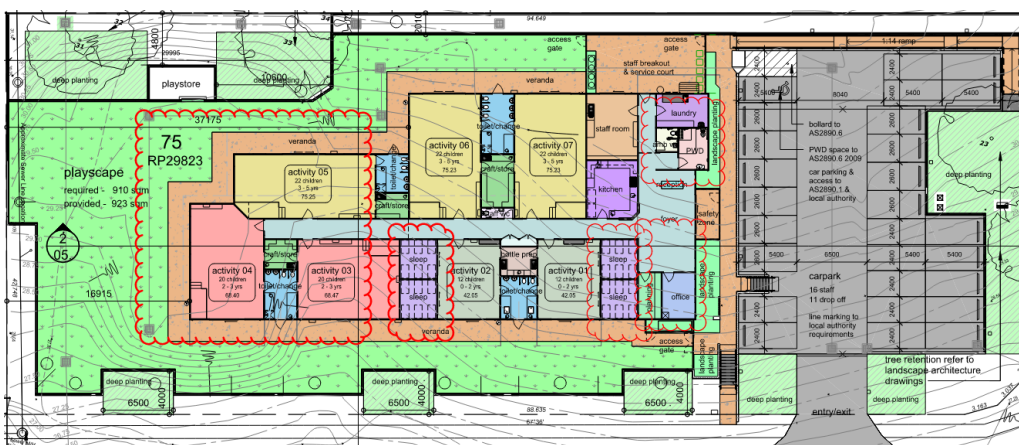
Proposed revised childcare centre Site / Floor Plan.
